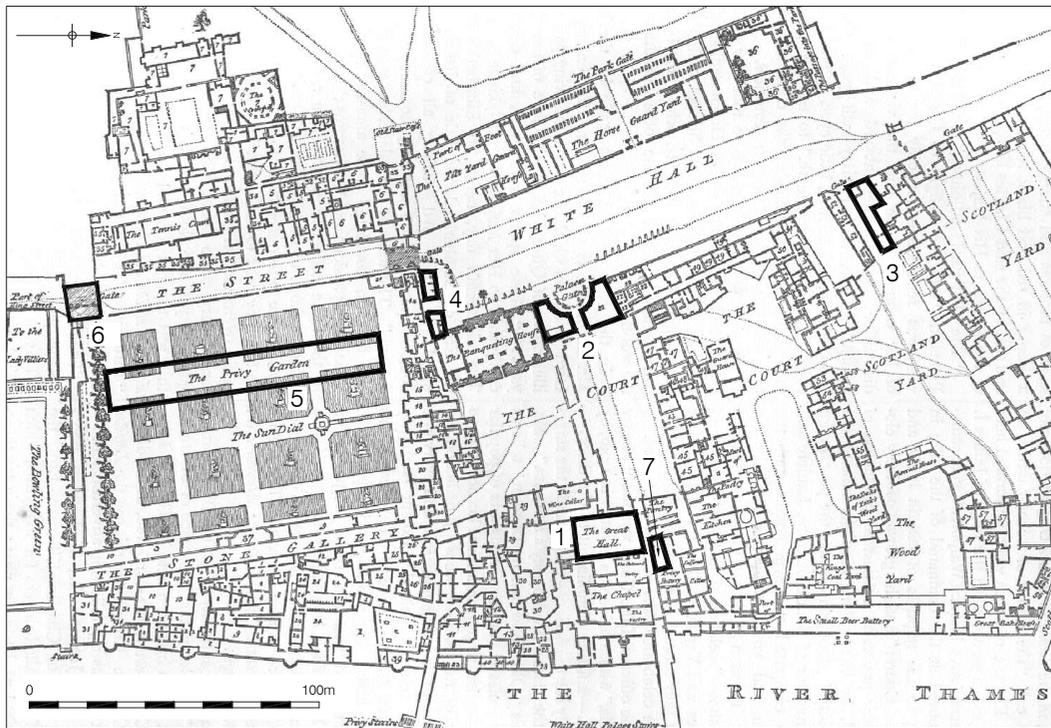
Fisher's 1670 Plan of Whitehall Palace. (1) Great Hall; (2) Court Gate; (3) Lodgings and Office of the Surveyor; (4) Gun platform; (5) Privy Garden; (6) King Street Gate; (7) Kitchen complex
